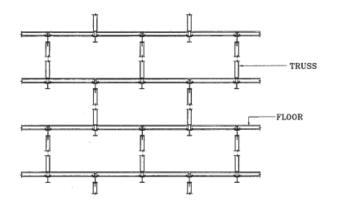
Staggered-truss system-vertical stacking arrangement.
